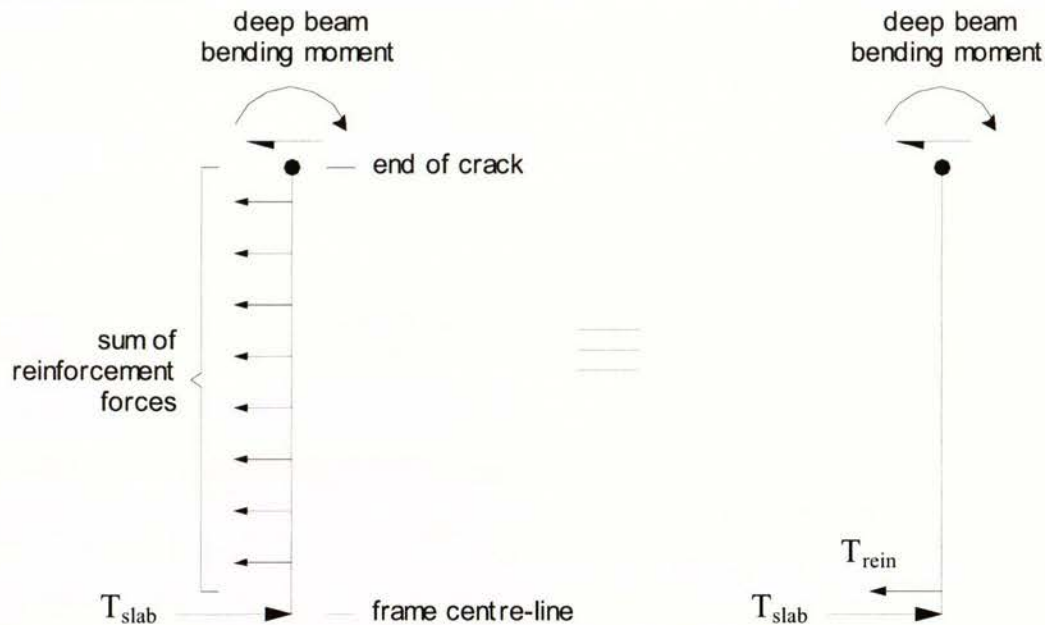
Forces acting at central column 'B' of Unit 2.
